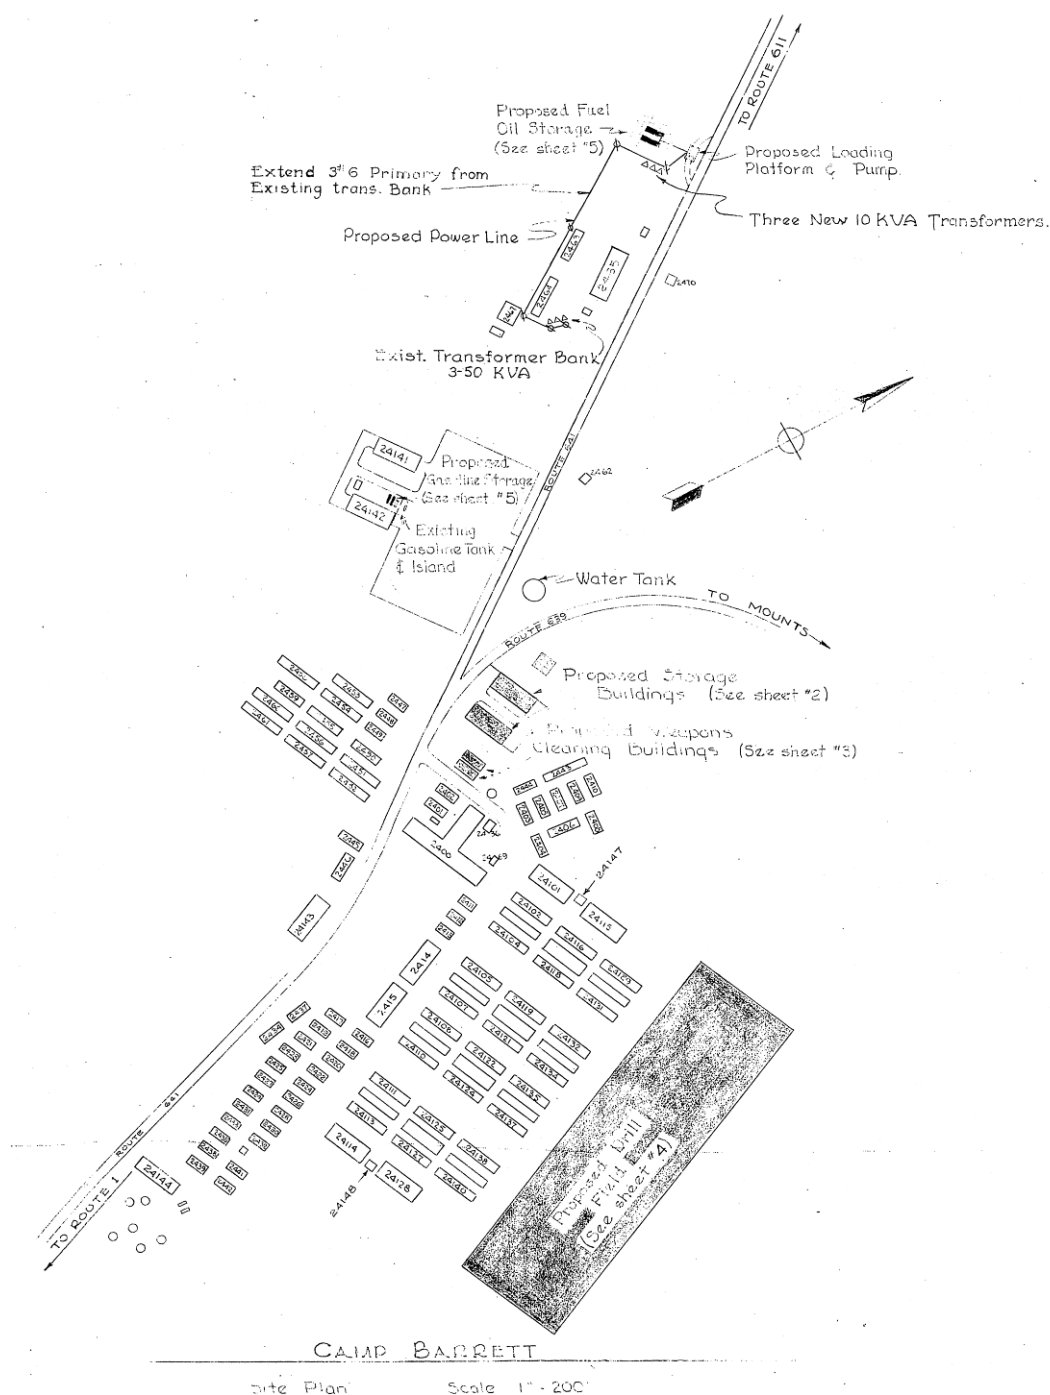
Site plan of Camp Barrett during camp expansion program, Marine Corps Schools, 5 February 1952 (NARA College Park).
